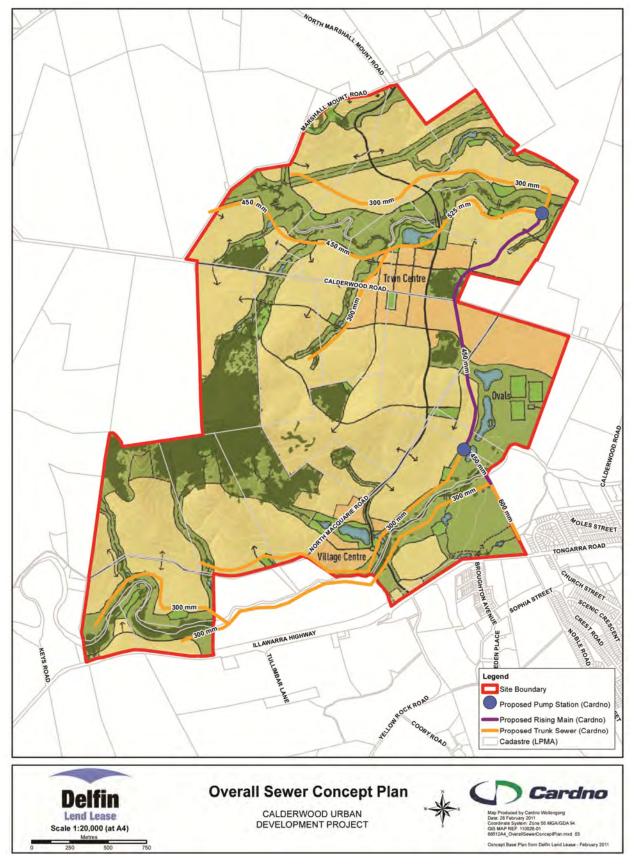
Overall Sewer Concept Plan (Source: Cardno 2010)
